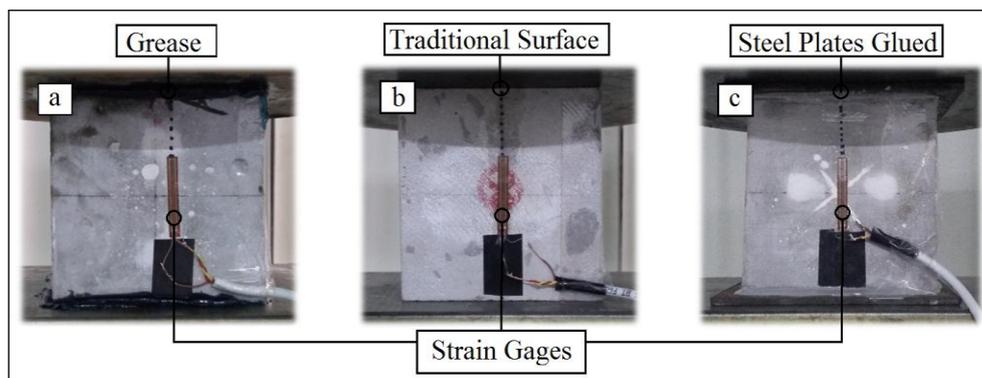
Test bodies: (a) minimum friction condition - grease; (b) traditional condition; (c) maximum friction condition - bonded metal sheets
